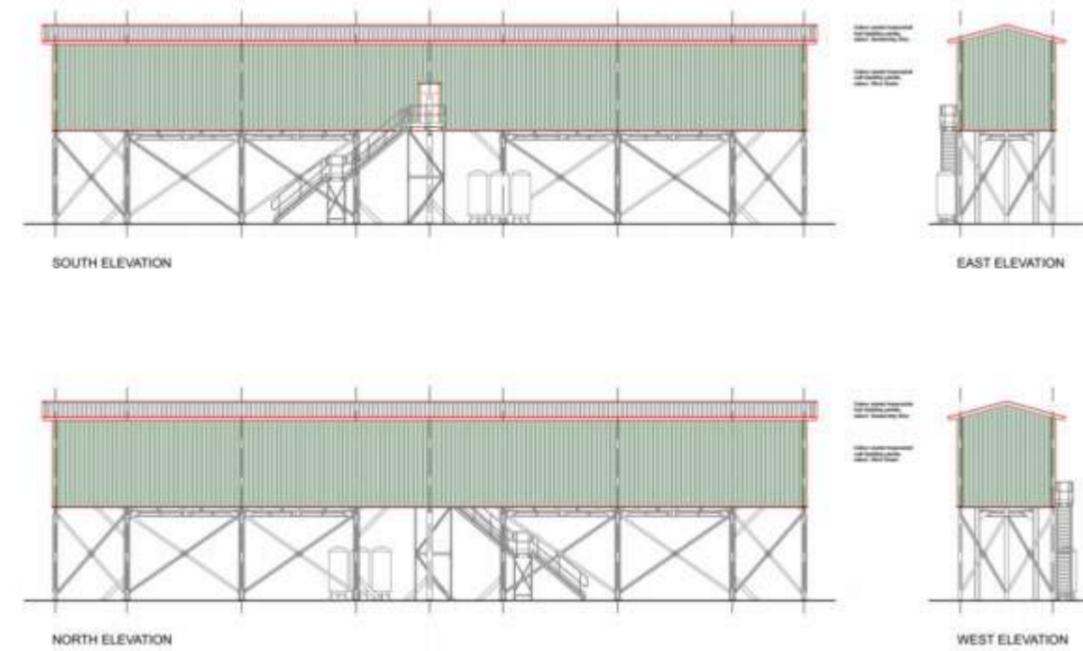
Proposed Elevations of Filter Press Structure © SLA Design
